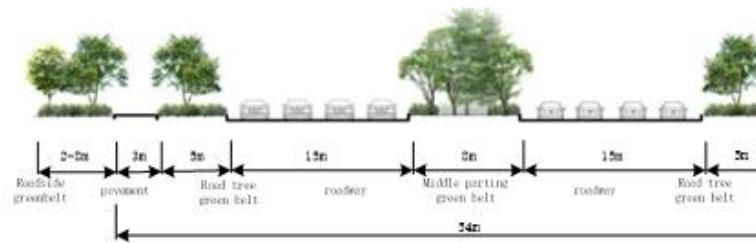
Horizontal Spatial Layout of Green Landscape of Urban Road
